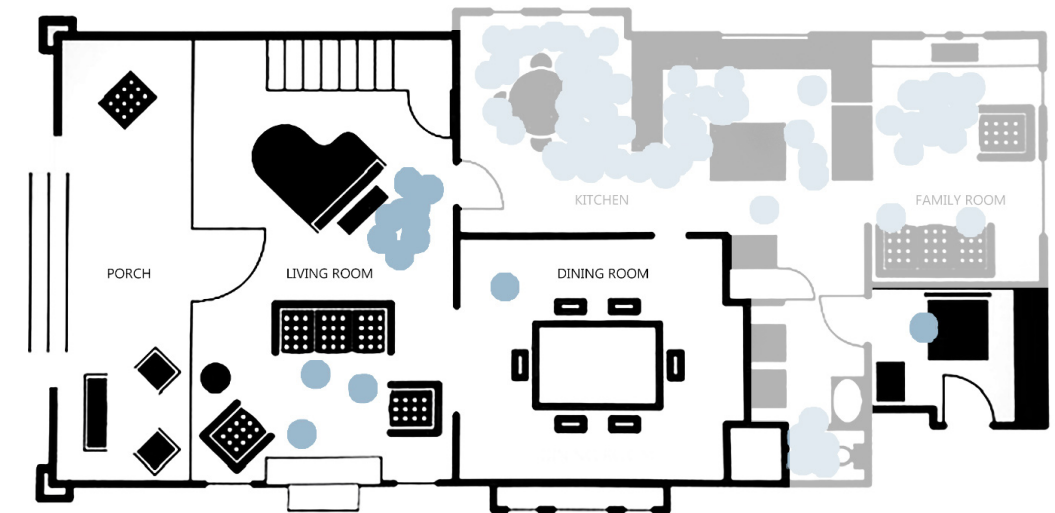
Daily activity in the floor plan. The unused spaces are the porch, living room, dining room and guestroom.
